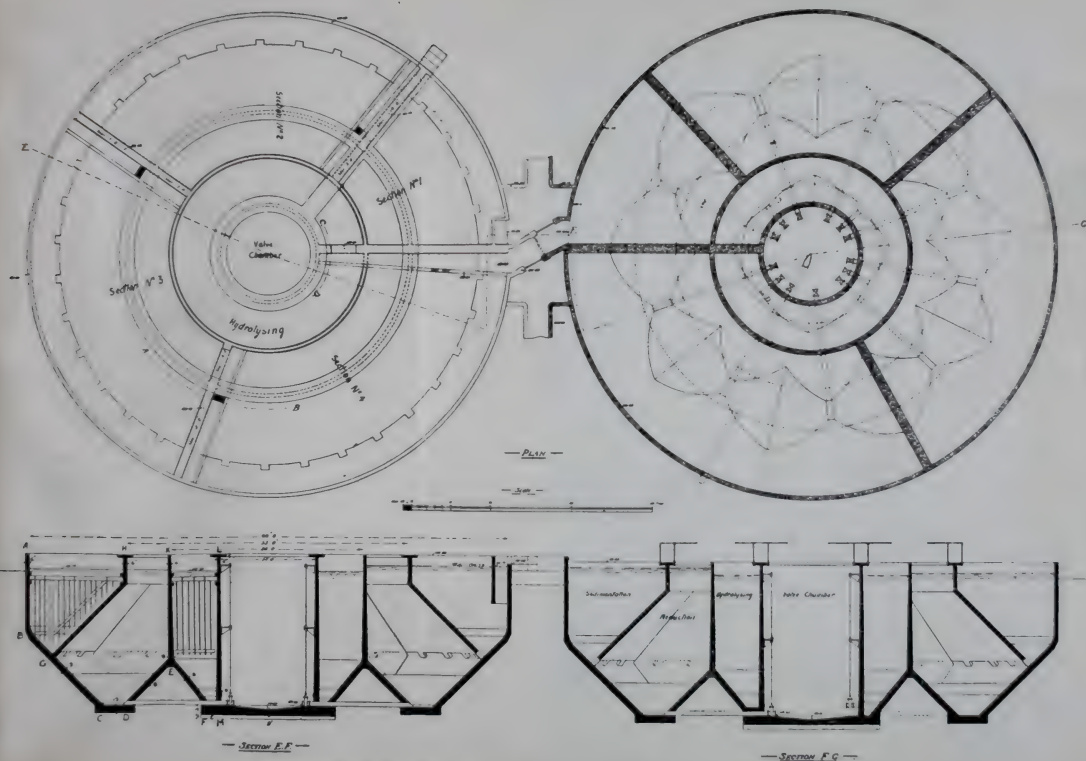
Reinforced Concrete Sewage Tanks, Dr. Travis' System: The Hydrolytic Tank Company.
